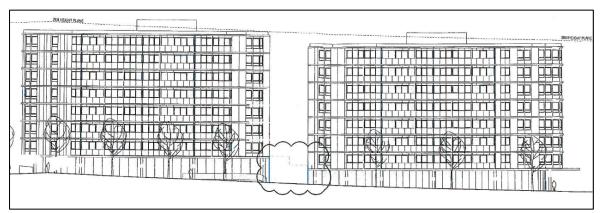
Southern elevation plan of approved development. Building C (pictured Left) and Building B (pictured Right).
